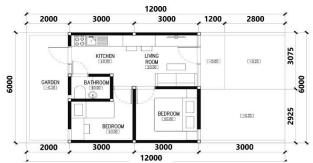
Floor Plan of Housing Prototype of 36 m<sup>2</sup>
